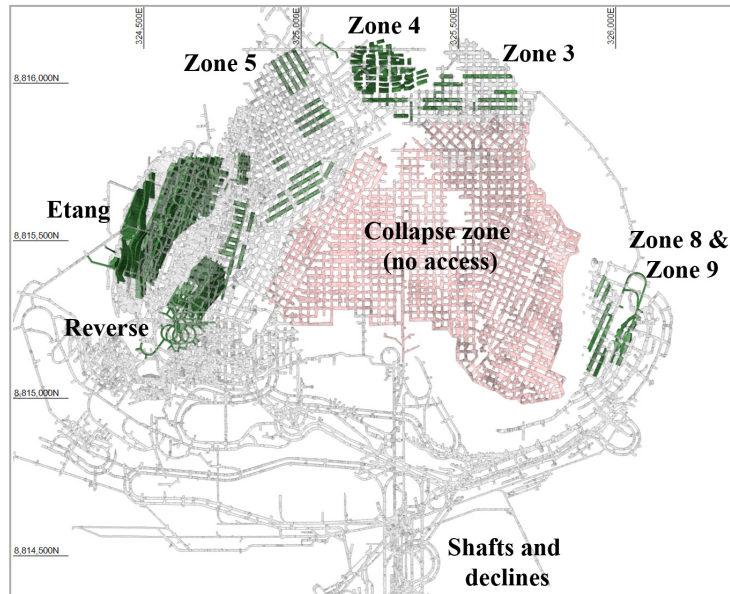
Plan view of the KTO mine with as-builts (grey), collapse zone (red) and future mining (green).
